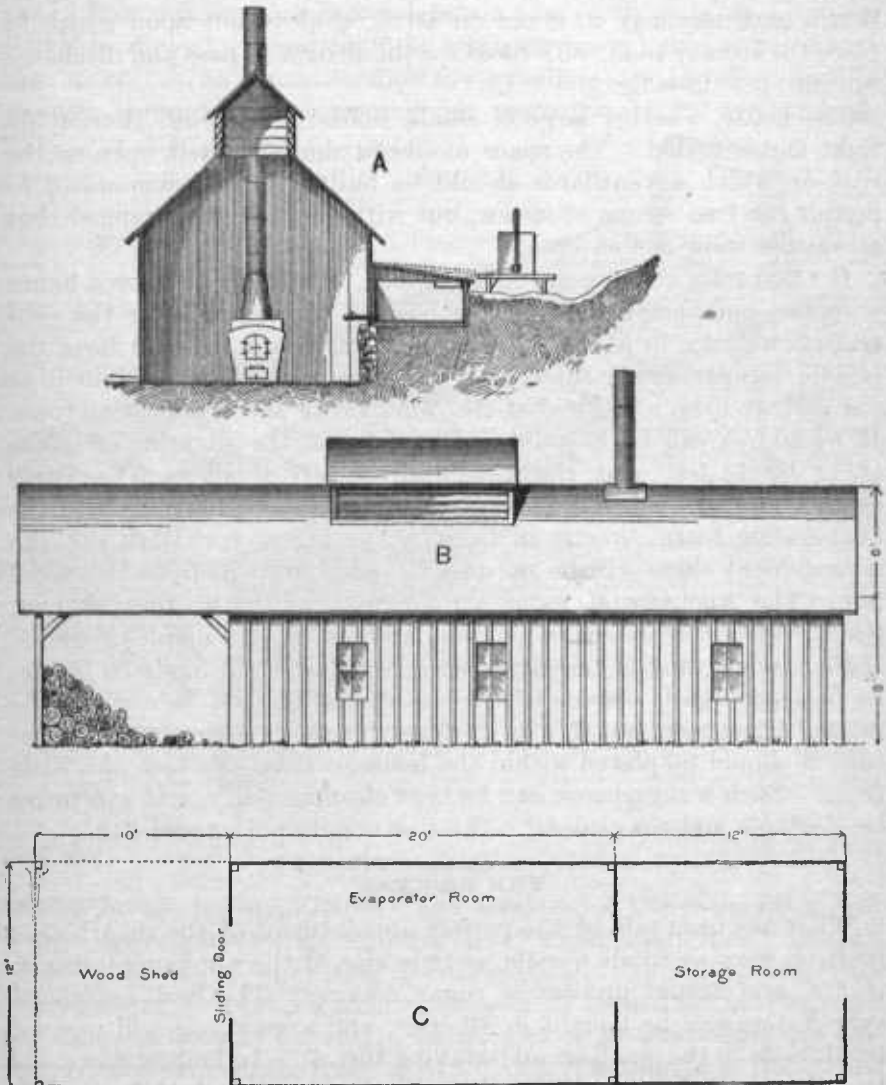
Plan of model sugarhouse: A. Sectional view, showing evaporator, storage tank, and gathering tank (on sled). B. Elevation. C. Ground plan.
